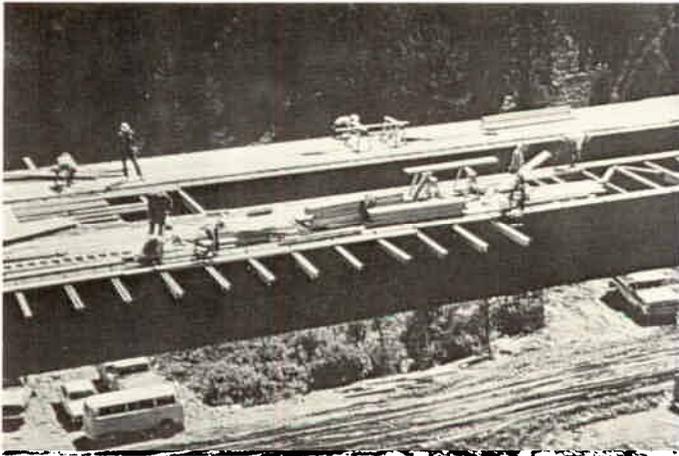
Vail Pass Colorado Bridges: formwork for concrete deck slab.
